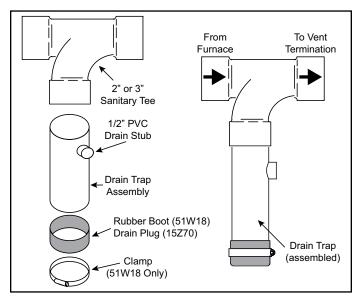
Kit 51W18 (USA) / 15Z70 (Canada) Parts Identification and Assembly
